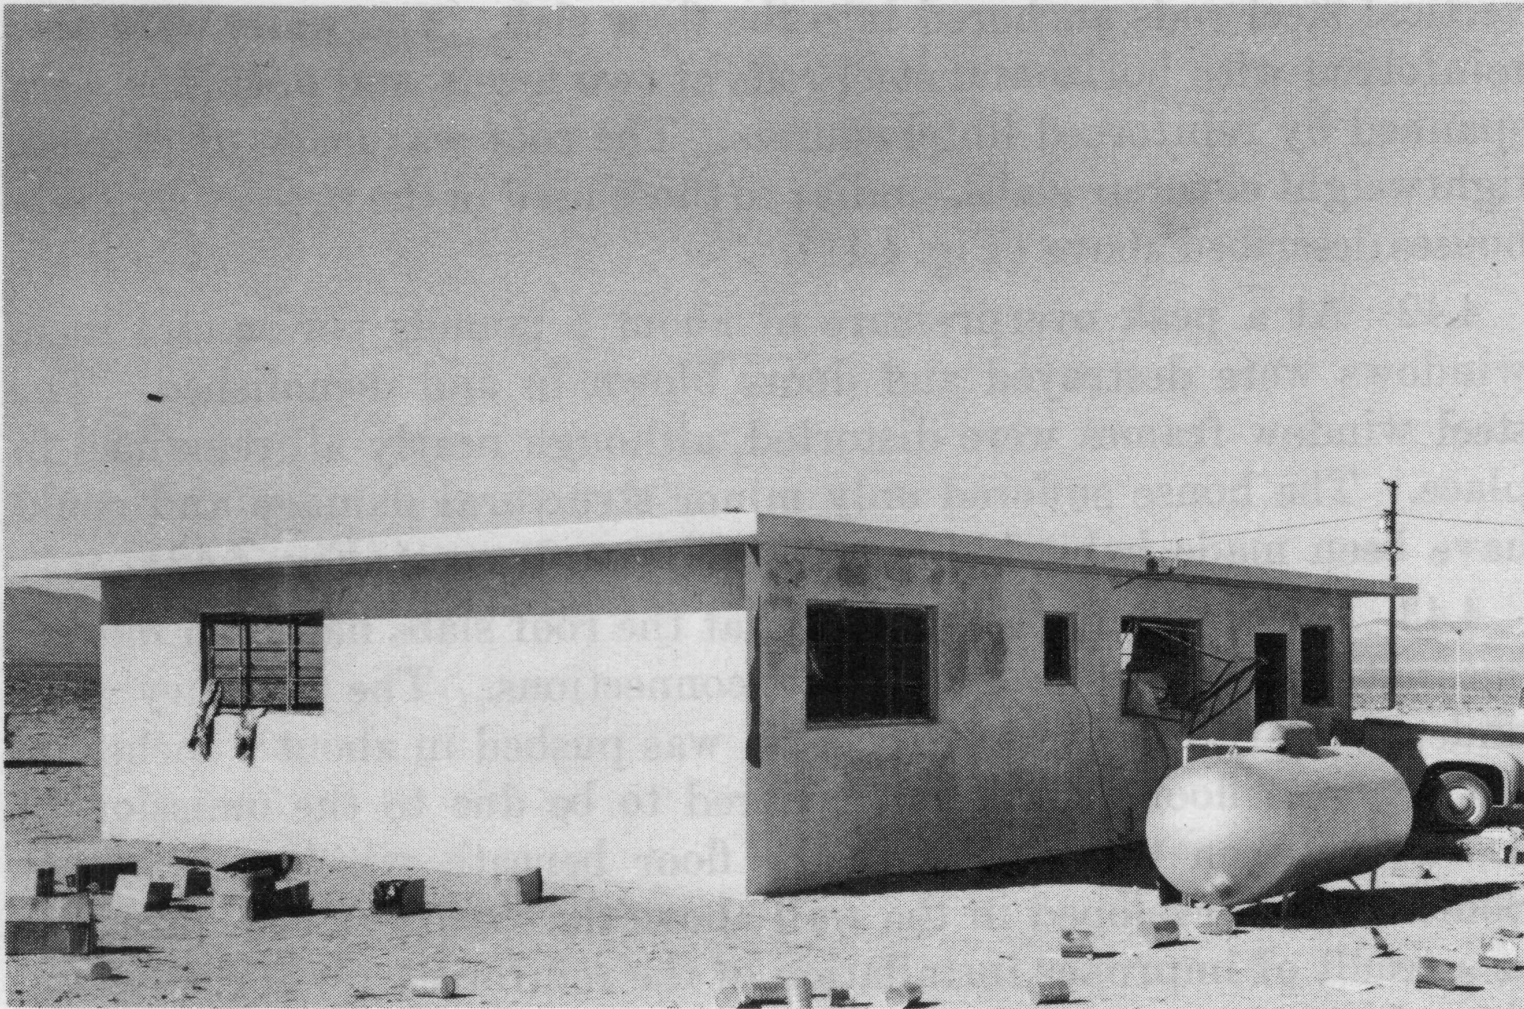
Reinforced precast concrete house after the nuclear explosion (5 psi overpressure). The LP-gas tank, sheltered by the house, is essentially undamaged.
